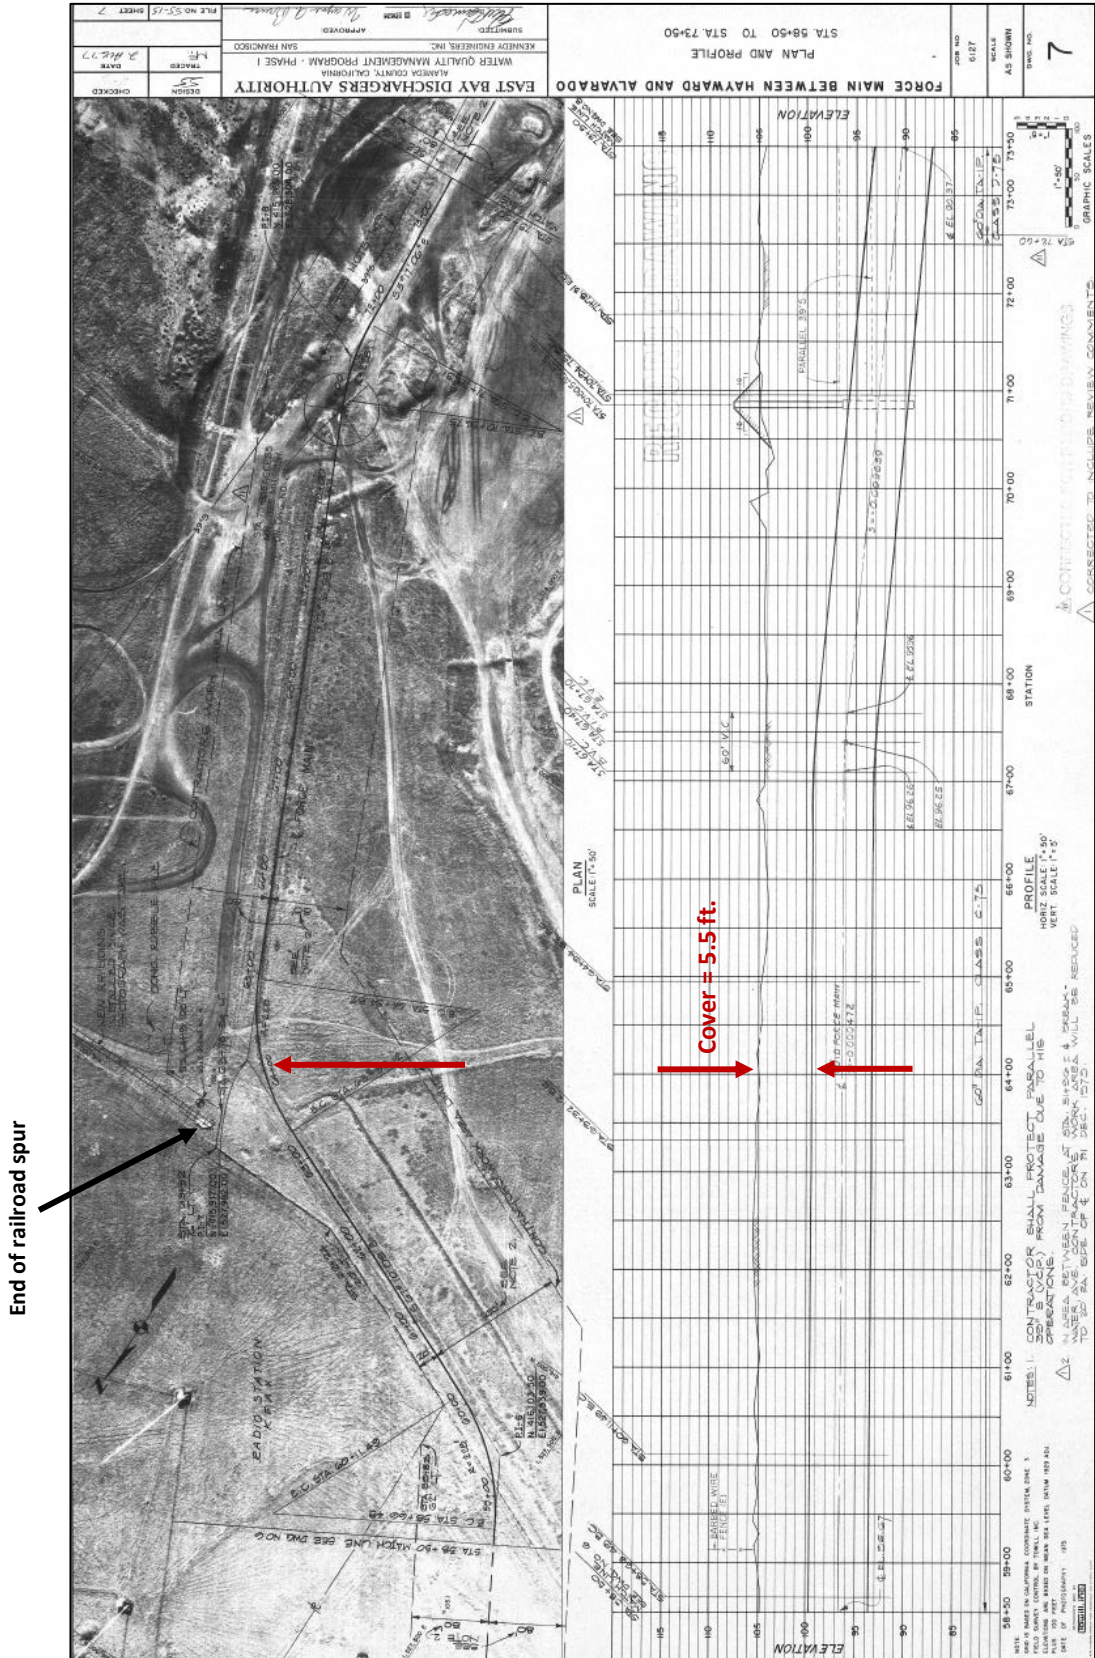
EBDA 60-inch RCP Force Main, 1977 plan and profile at the EBRPD construction access road crossing.
